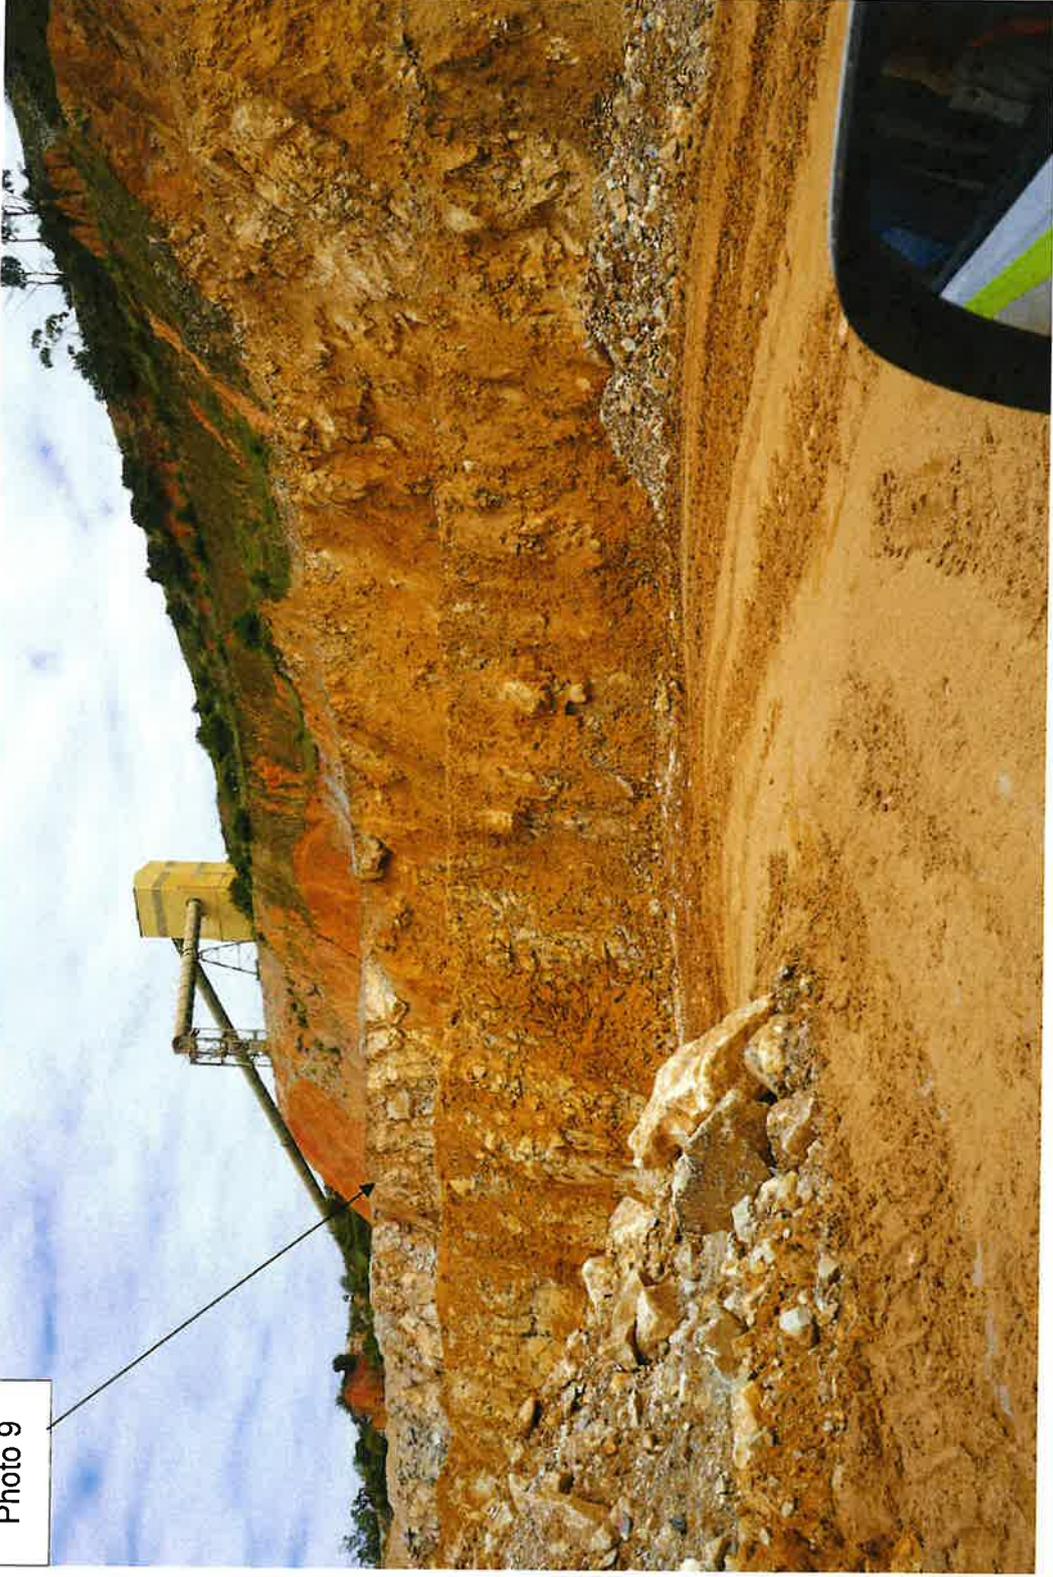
West wall in the northern end of North pit and highlighting zone of limestone of poor rock mass quality.
